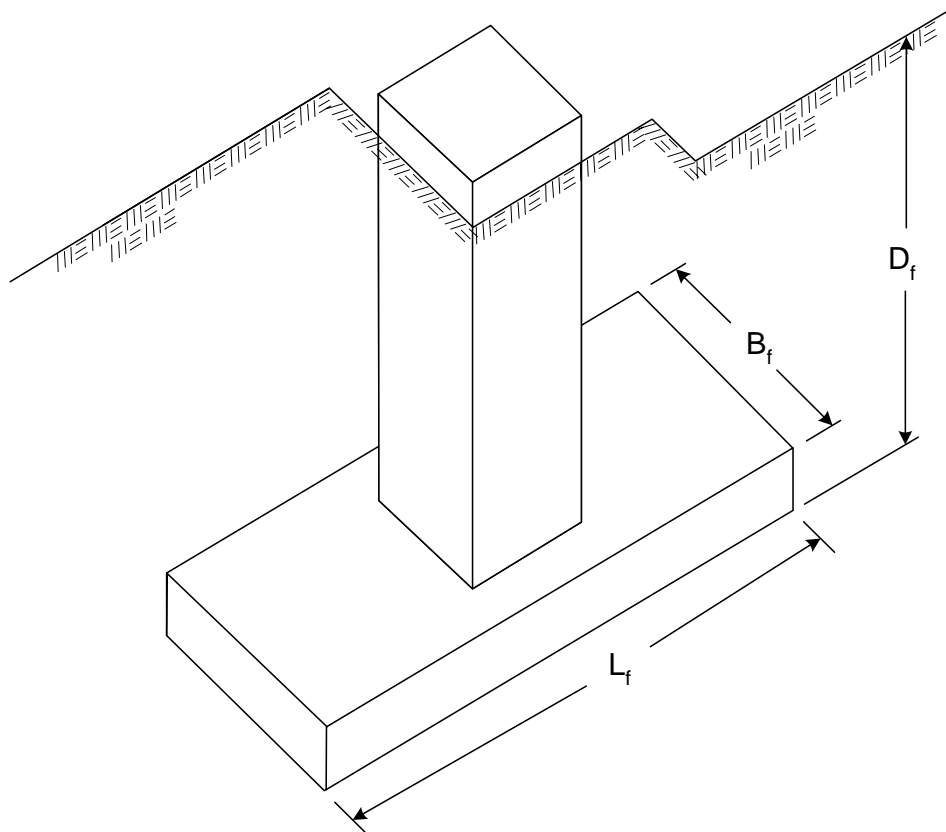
Geometry of a typical shallow foundation (FHWA, 2002c, AASHTO 2002).
